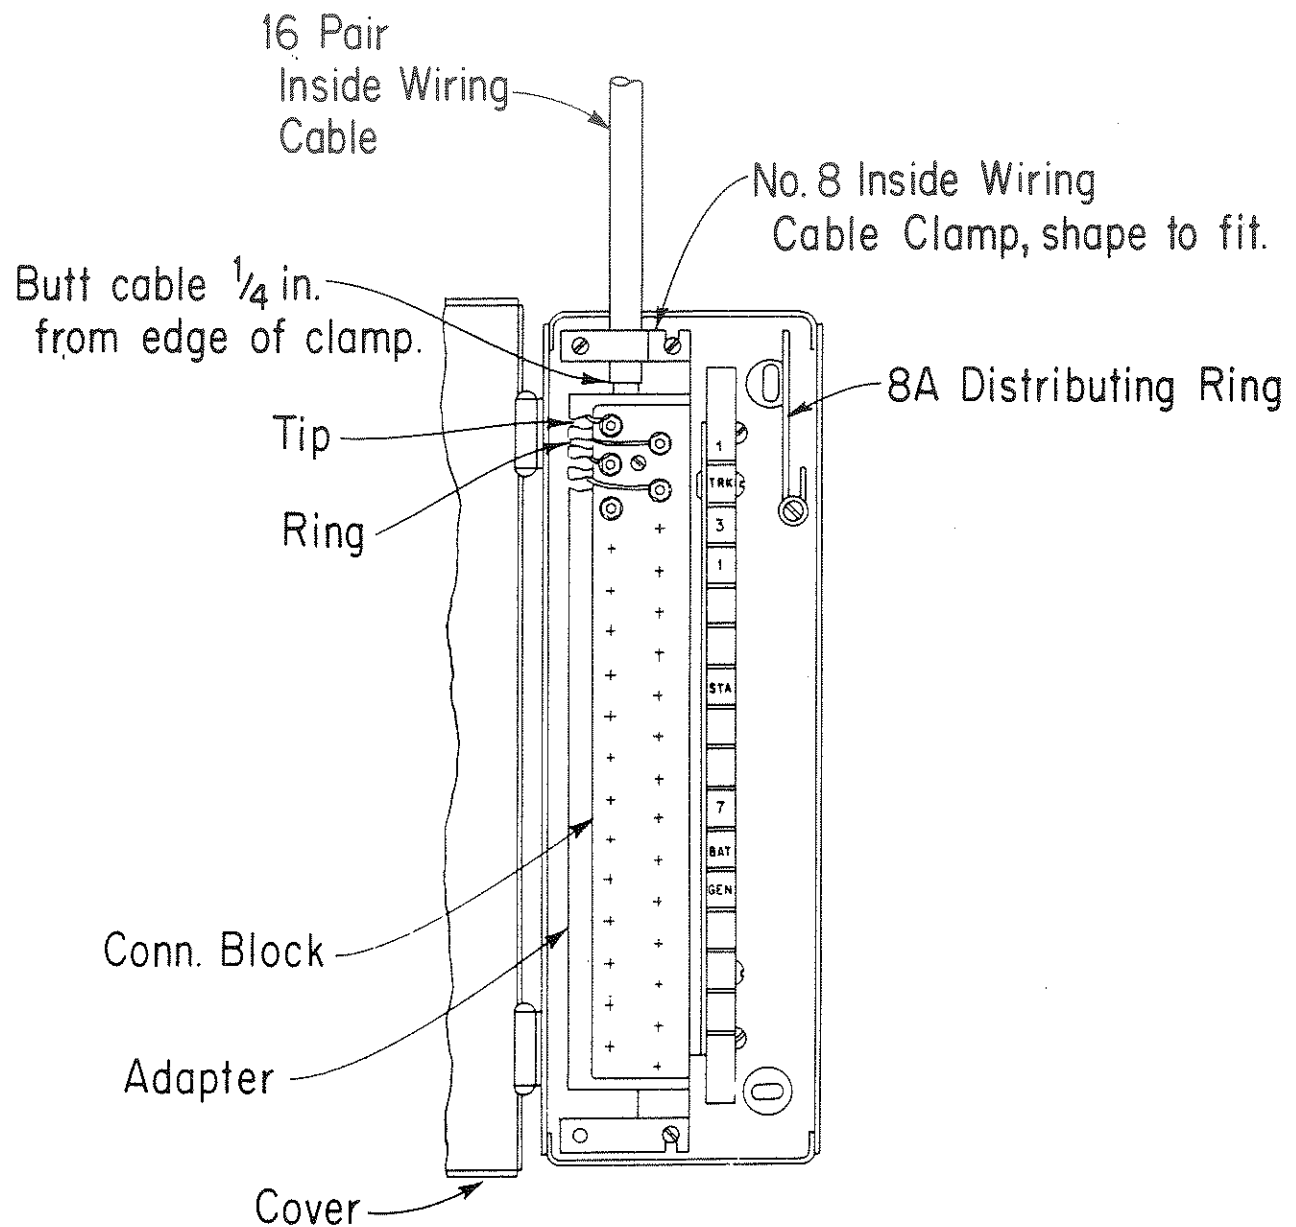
Typical Arrangement for 507A PBX with Prefabricated Sheet Metal or Die-Cast Aluminum Chassis
